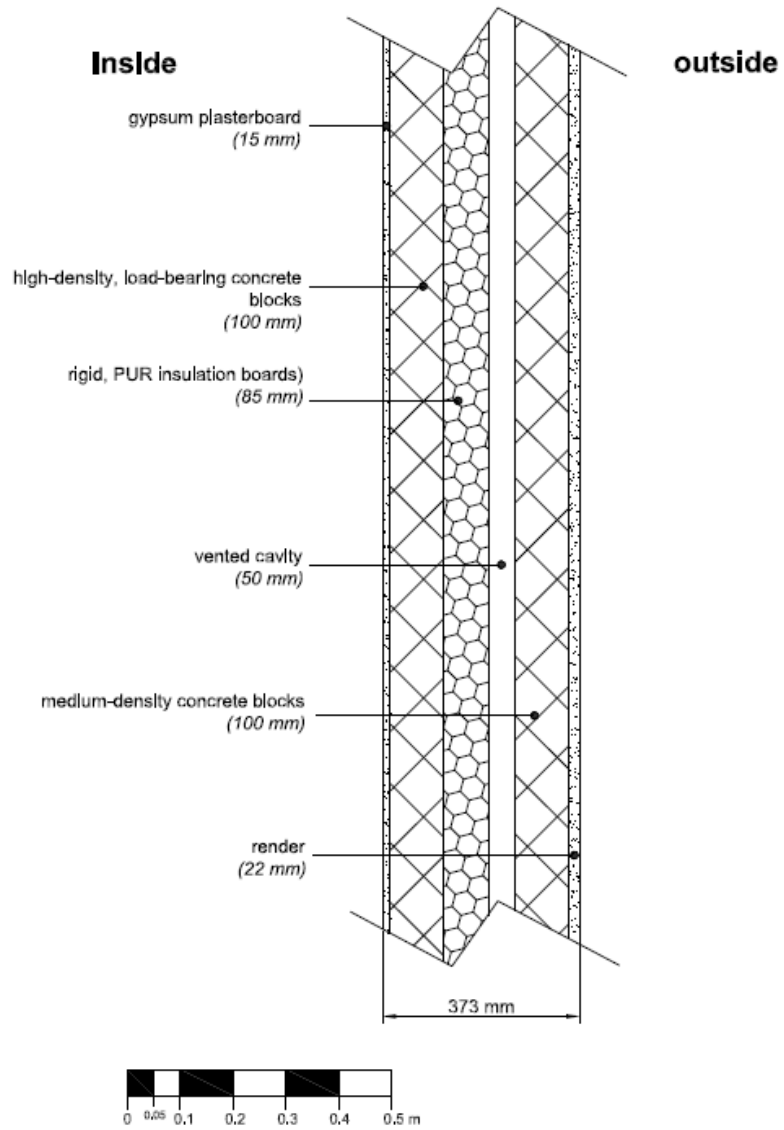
Wall F (load-bearing masonry), horizontal section.
